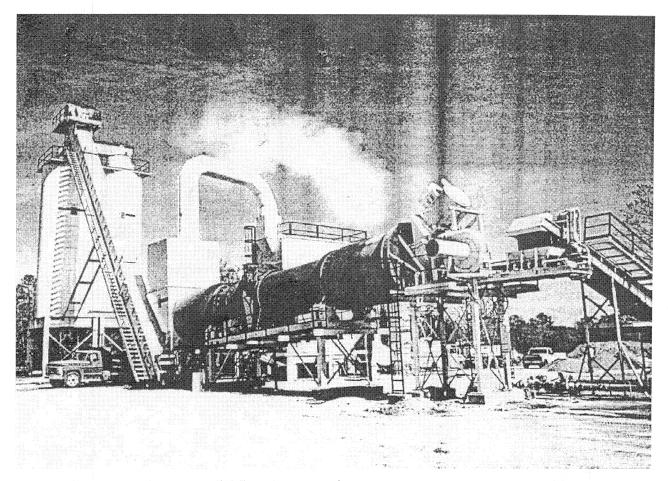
Typical HMA parallel-flow drum-mix plant.
